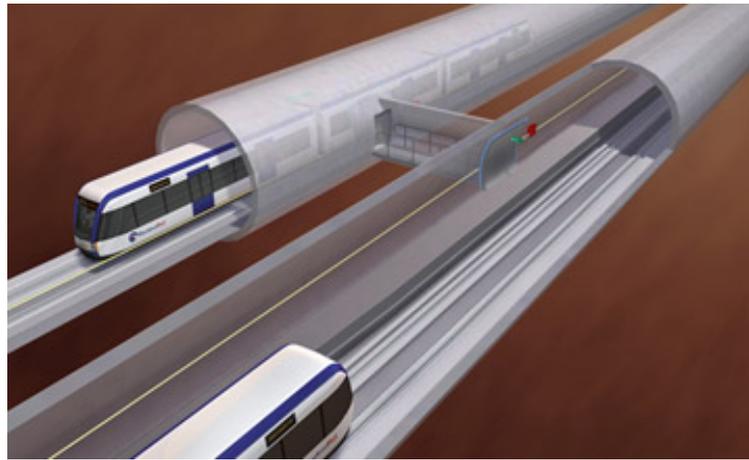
Drilling tunnel Rotterdam (RGI-029)
